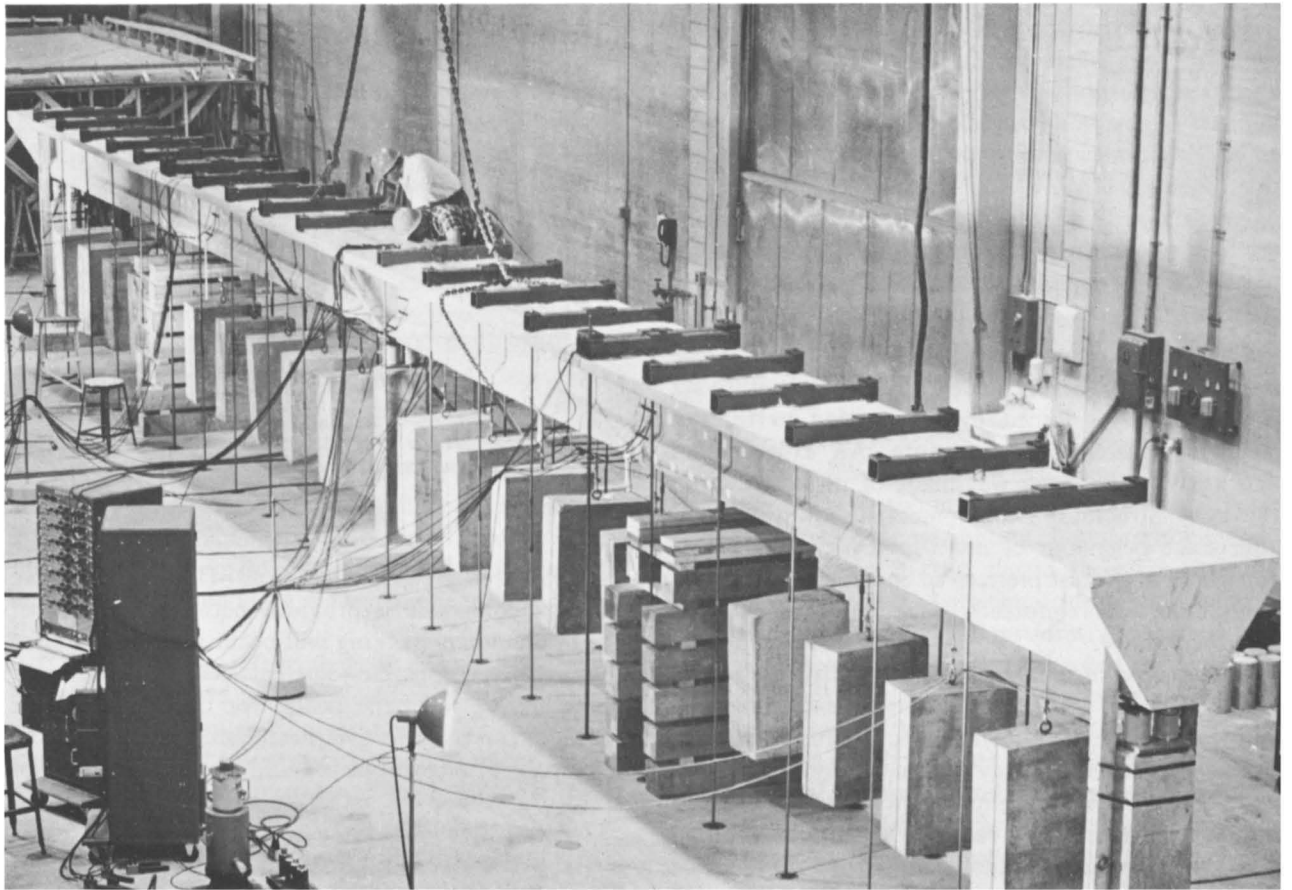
Figure II: Test on a half-size precast prestressed concrete bridge beam.
